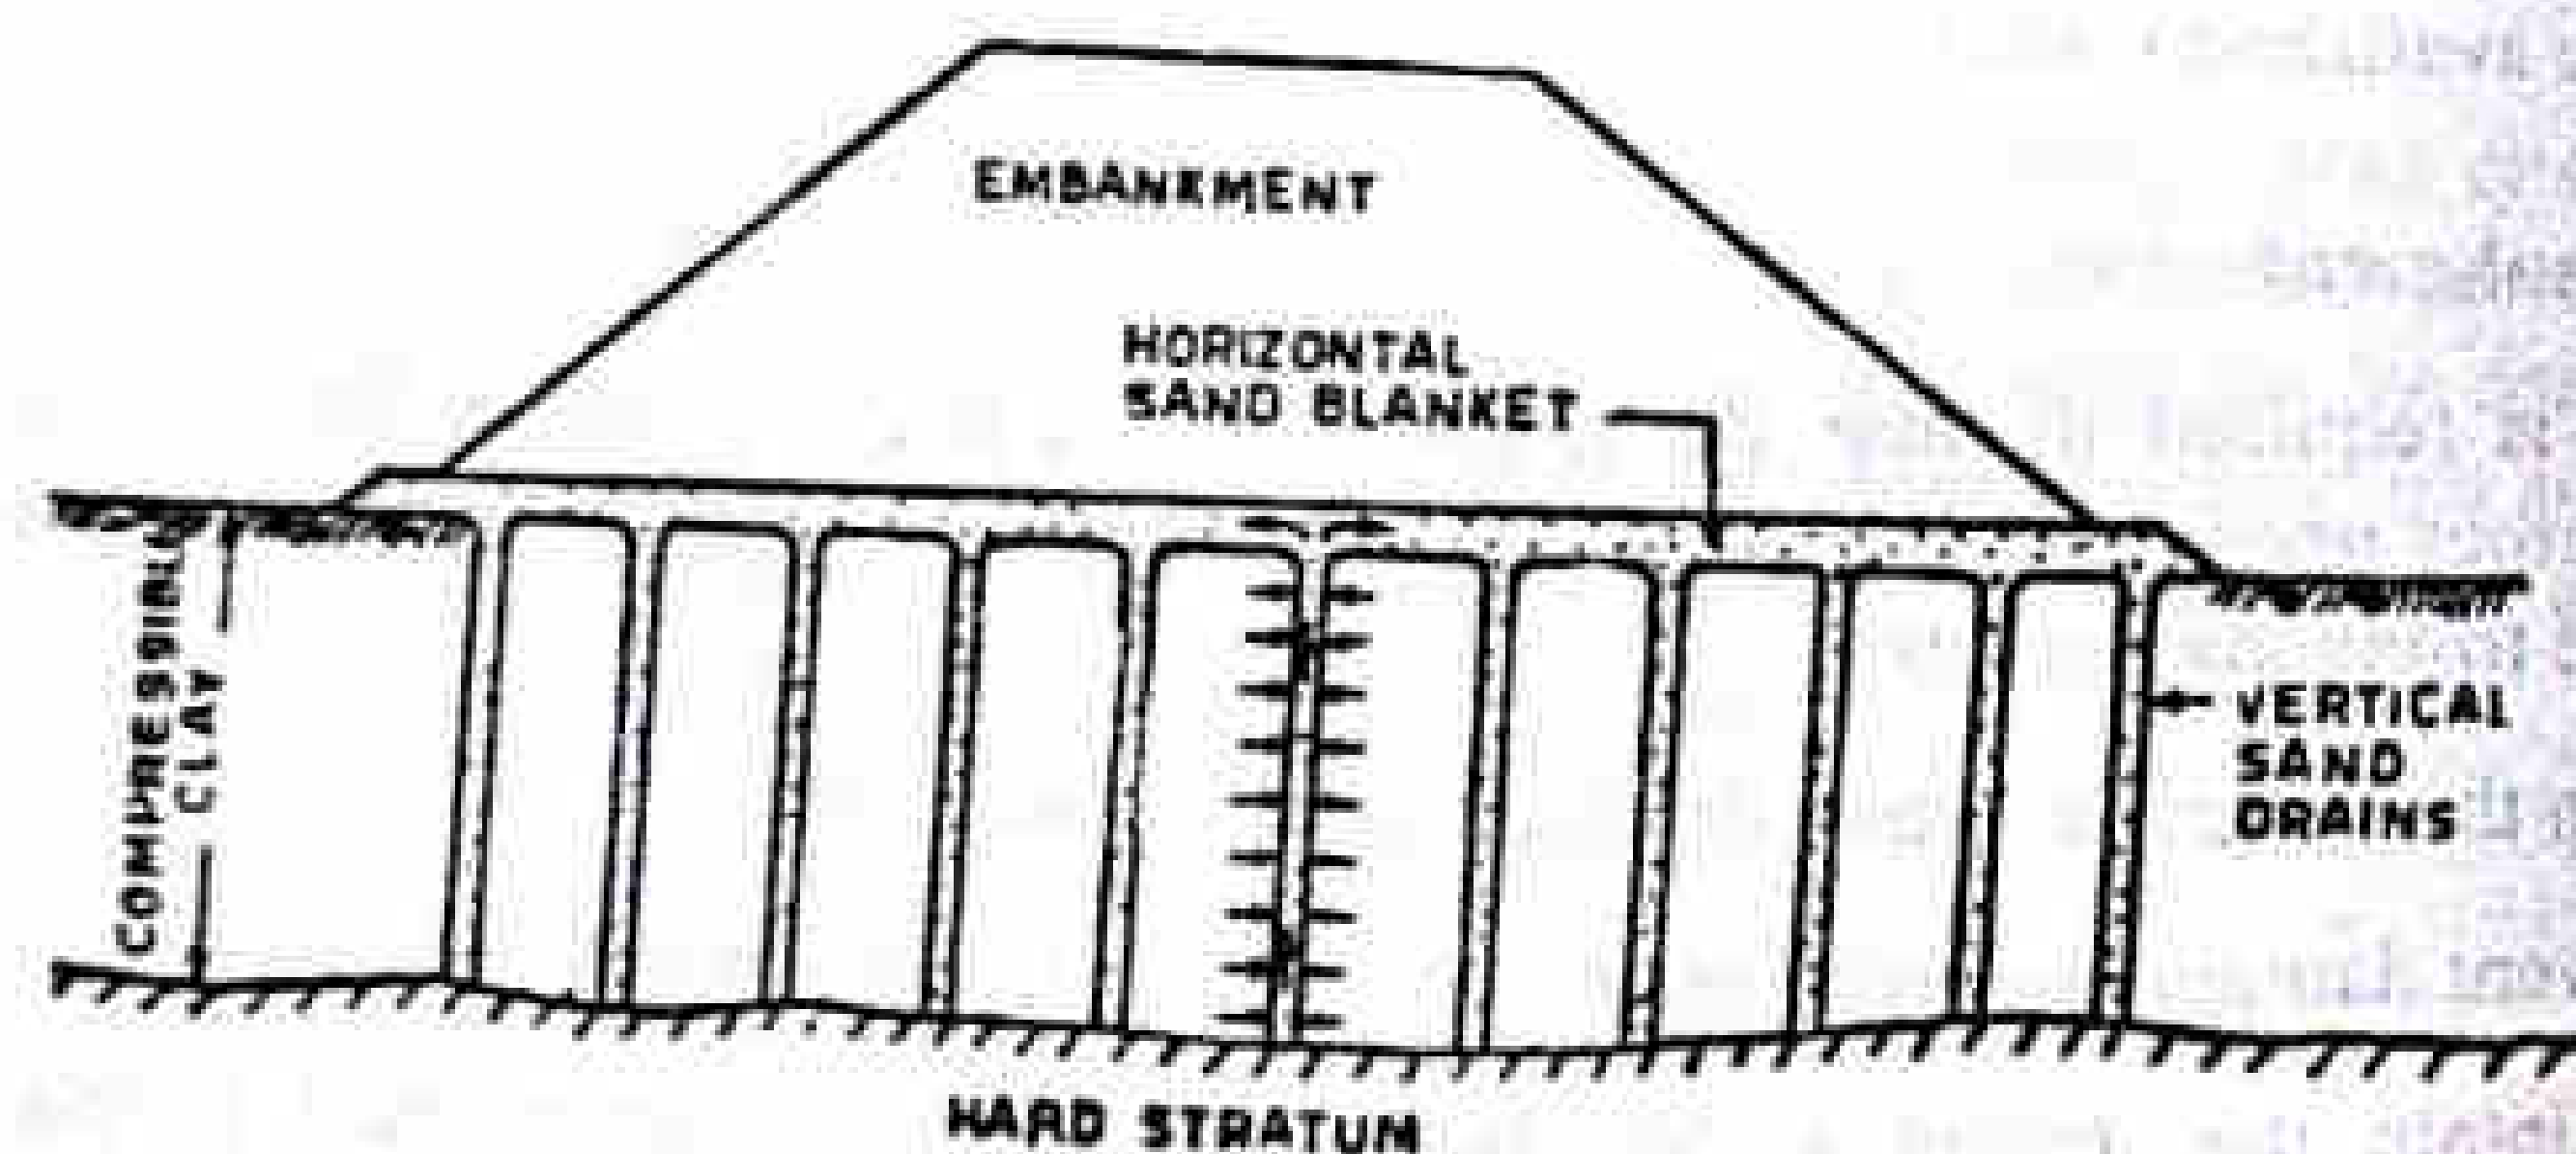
Embankment with Vertical Sand Drains at Foundation
